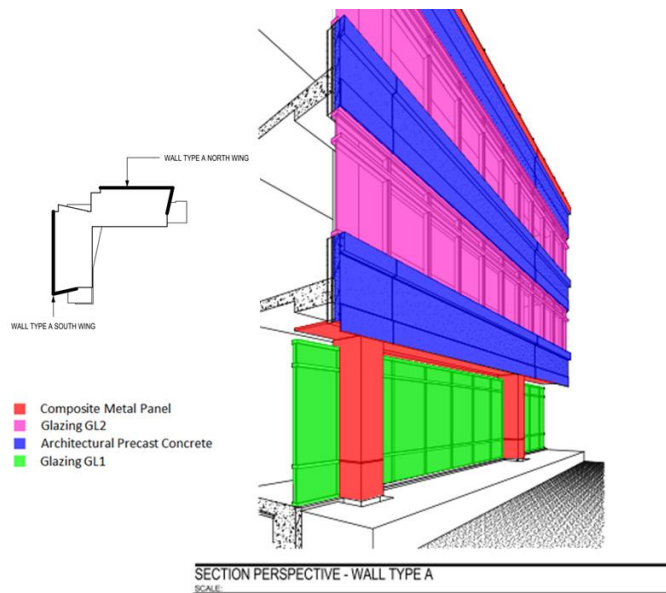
Façade Materials on North & South Wing (Original Drawing Underlay Courtesy of Gensler)
